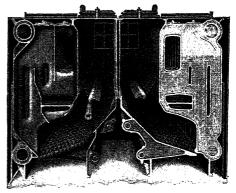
Sectional view of two magazine Boilers coupled together (Ideal Boilers and Radiators, Ltd.)
